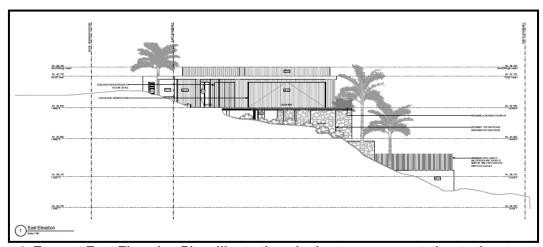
Excerpt East Elevation Plan, illustrating single-storey presentation to the streetscape
